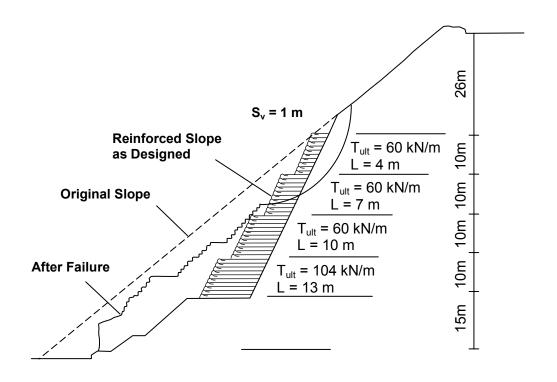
Cross section of the failed reinforced slope (adapted from Huang 2000)
